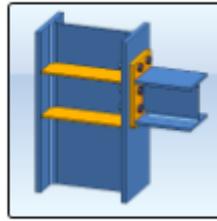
Civil engineering function button - Front plate connection to flange (2330)
